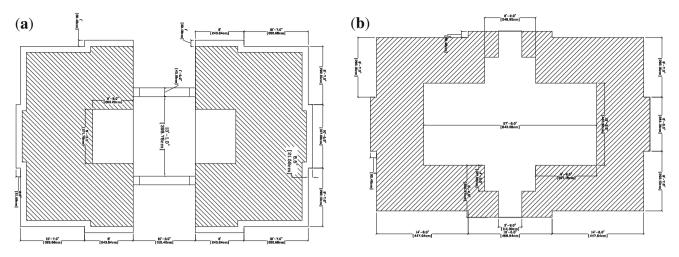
Typical configuration of a *gopuram* in plan: (a) ground storey, (b) upper stories.
